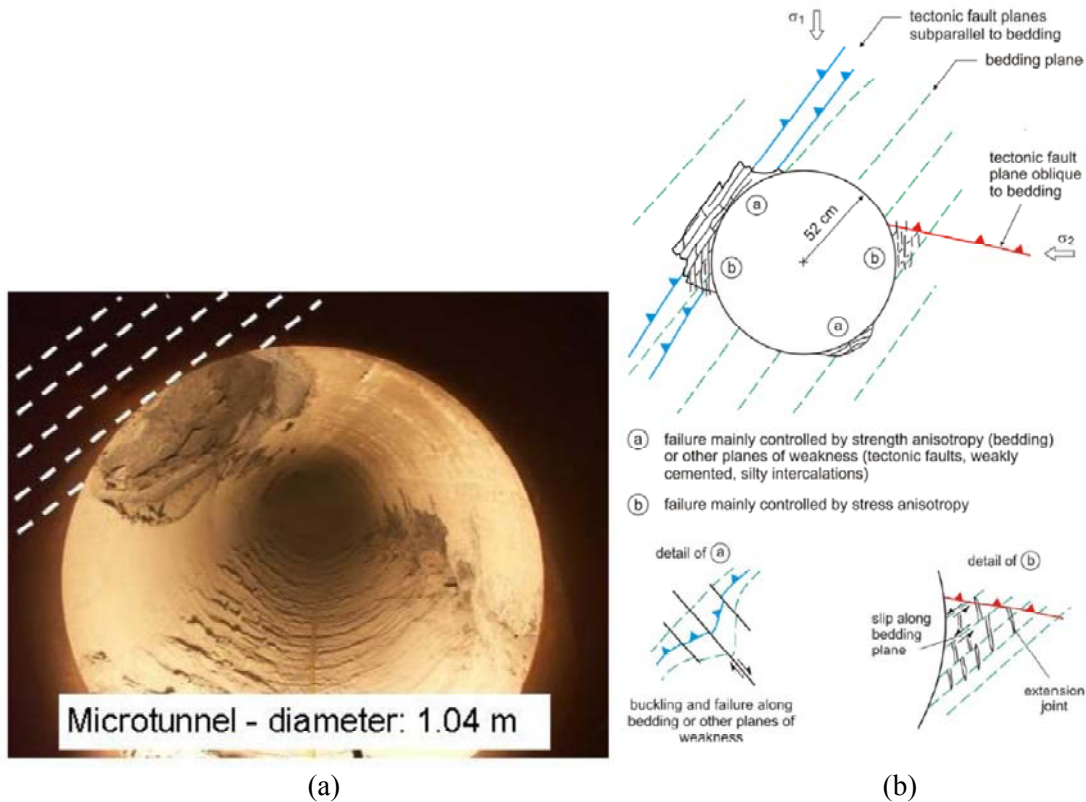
Excavation damage. (a) Breakouts along microtunnel walls, with an orientation looking from the HG-A Niche towards back end of microtunnel (source: Marschall et al., 2006); (b) Conceptual diagram of the damage zone with the same orientation as in (a). (source: Lanyon et al., 2009; Marschall et al., 2006)
